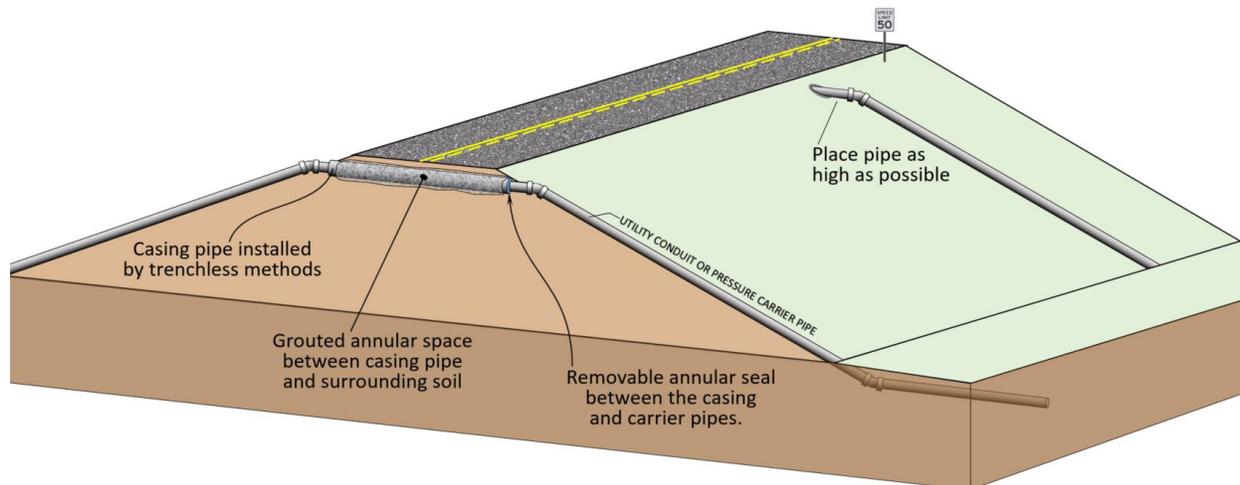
Example of allowable, non-essential pipe crossing beneath a highway.
